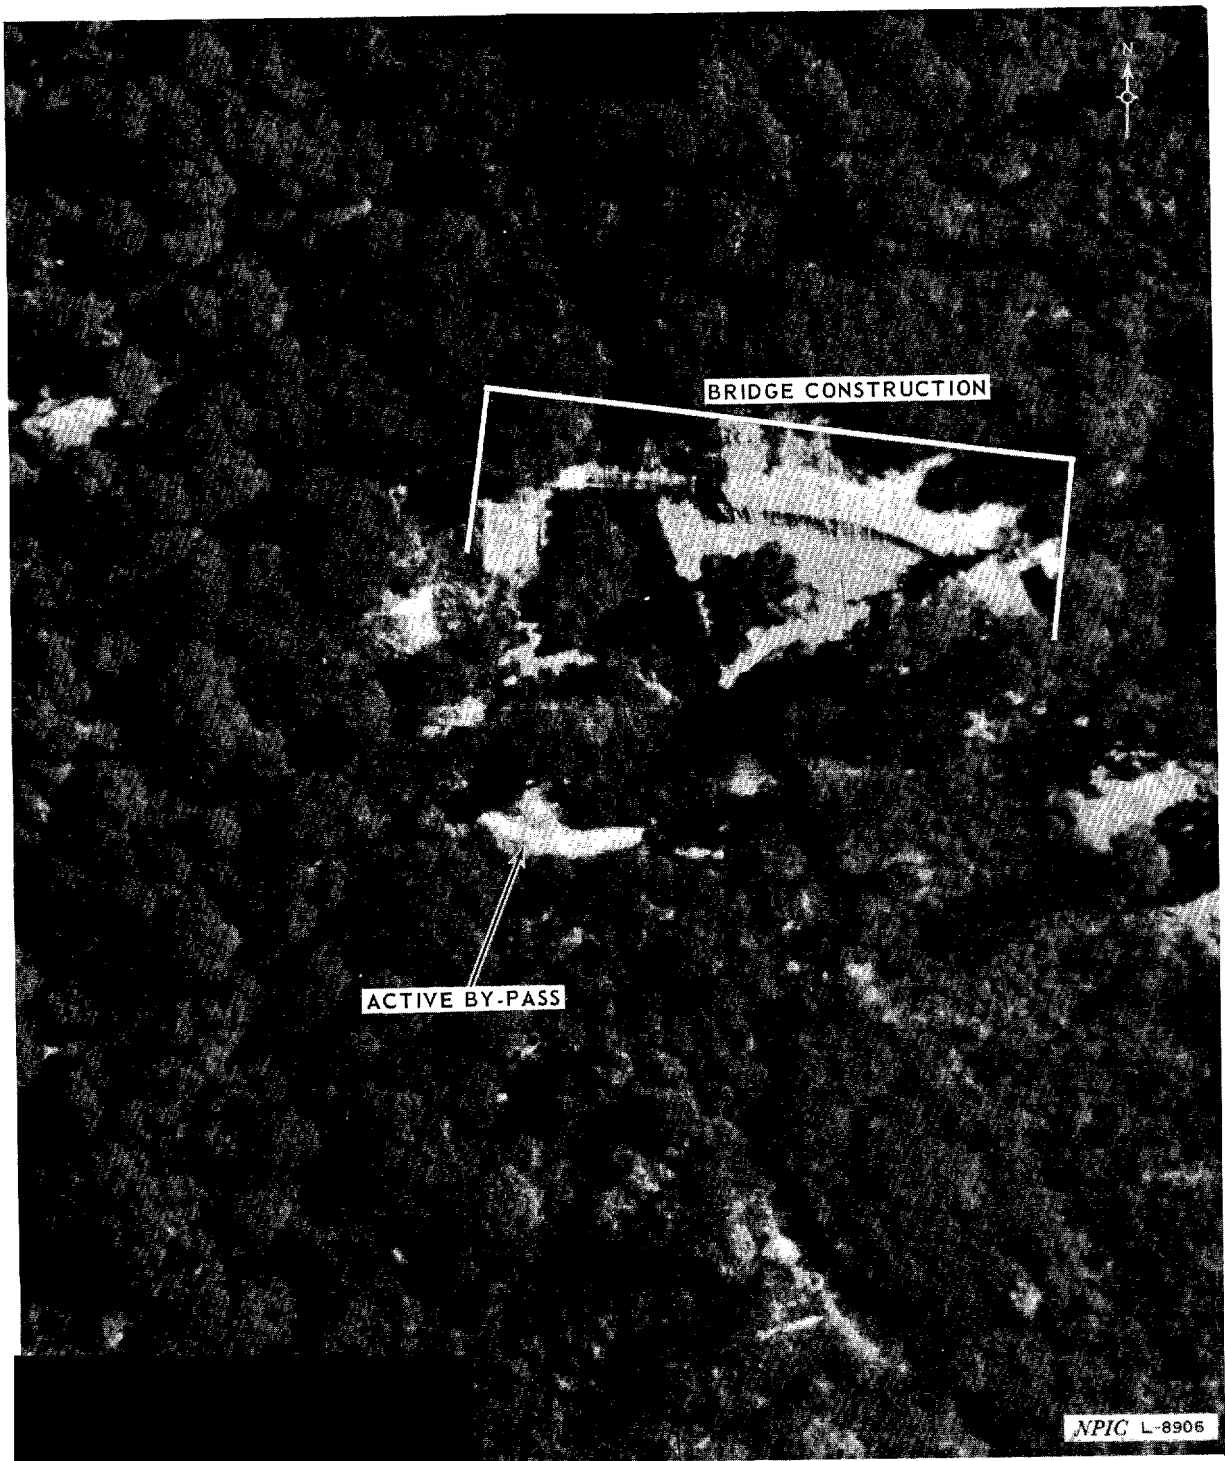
BRIDGE CONSTRUCTION, ROUTE 194, CAMBODIA
